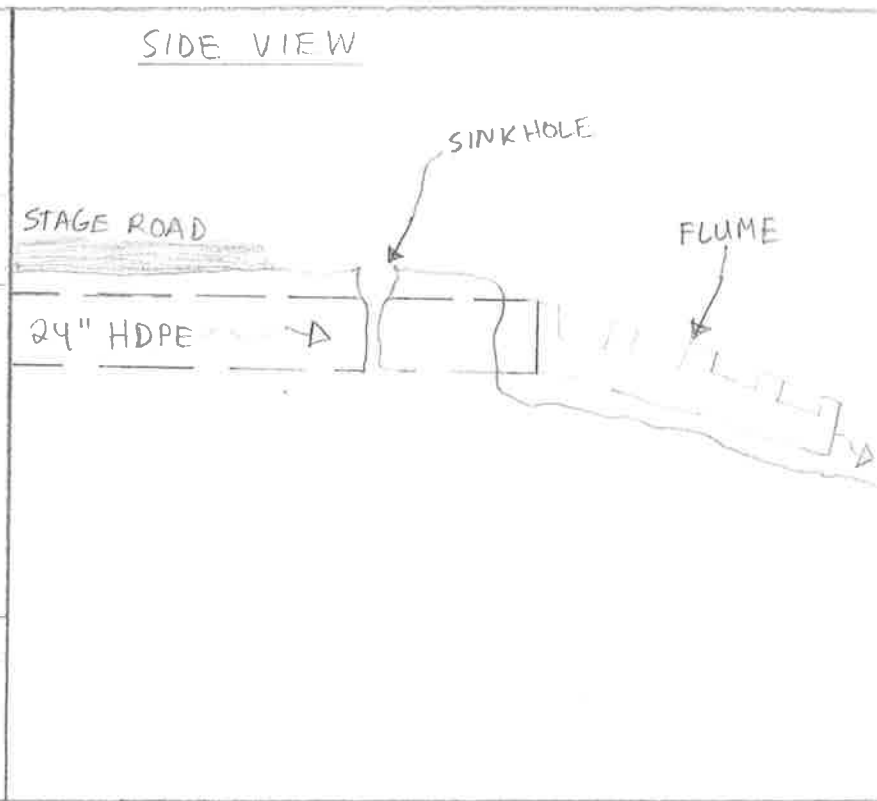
STAGE #2 PROJECT SITE - CULVERT REATTACHMENT
